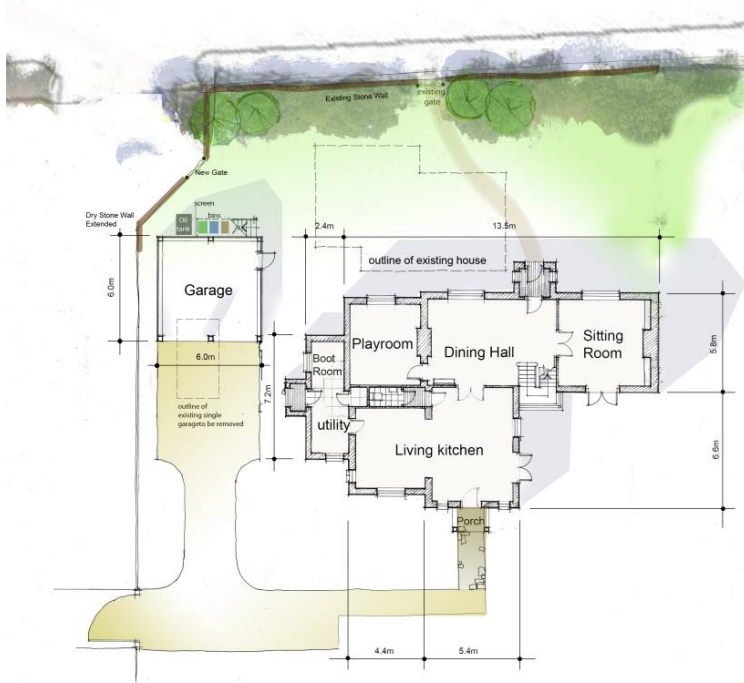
Extract of Proposed Ground Floor Plan approved as part of application 13/O1372/FUL.
